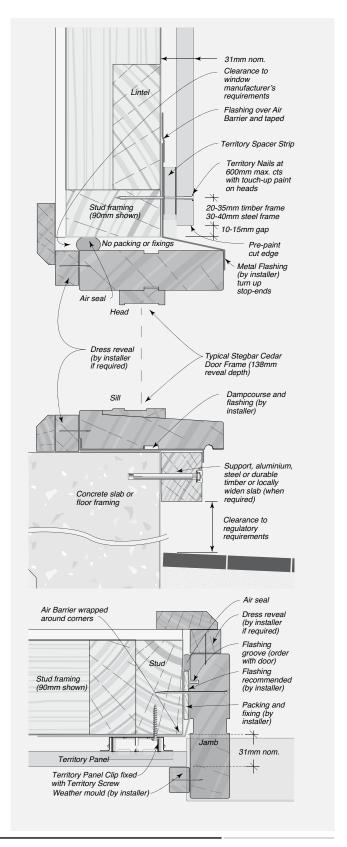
Typical Stegbar Sliding or Entry Door
